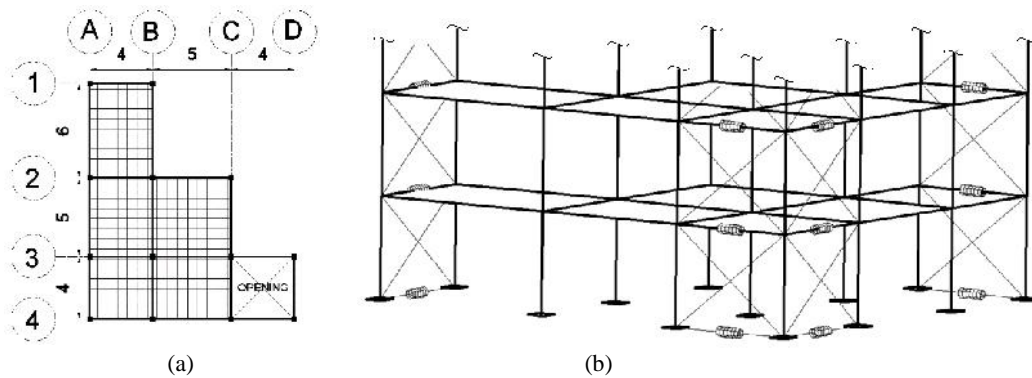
View and plan of 3D eight-story building with active tendons and their locations
